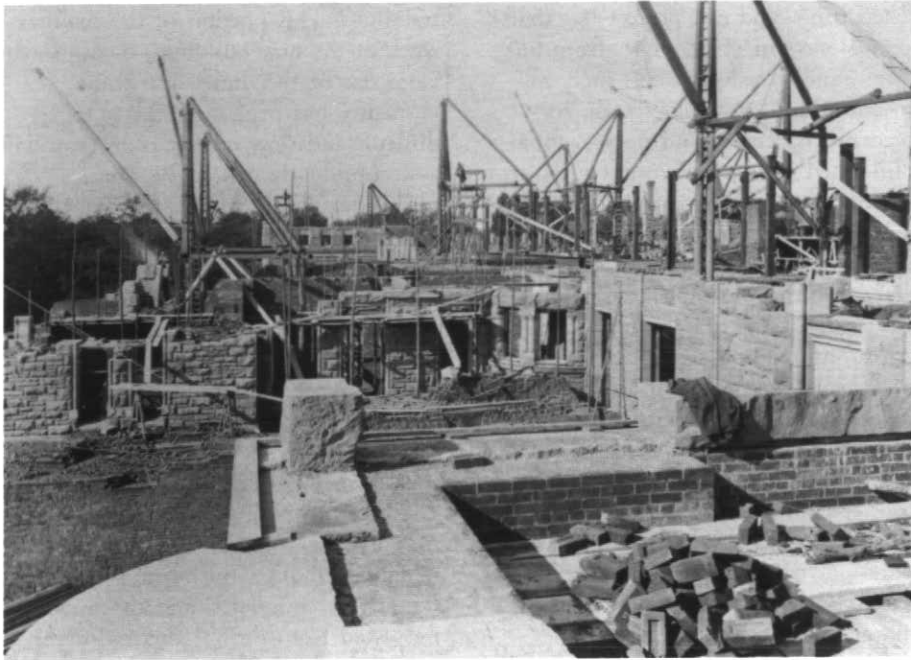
View west from the east or Departmental Wing across the Great Hall with the Member's Wing and library in the distance. (Archives of Ontario, RG 15-74-0-1.1, AO 5968)
